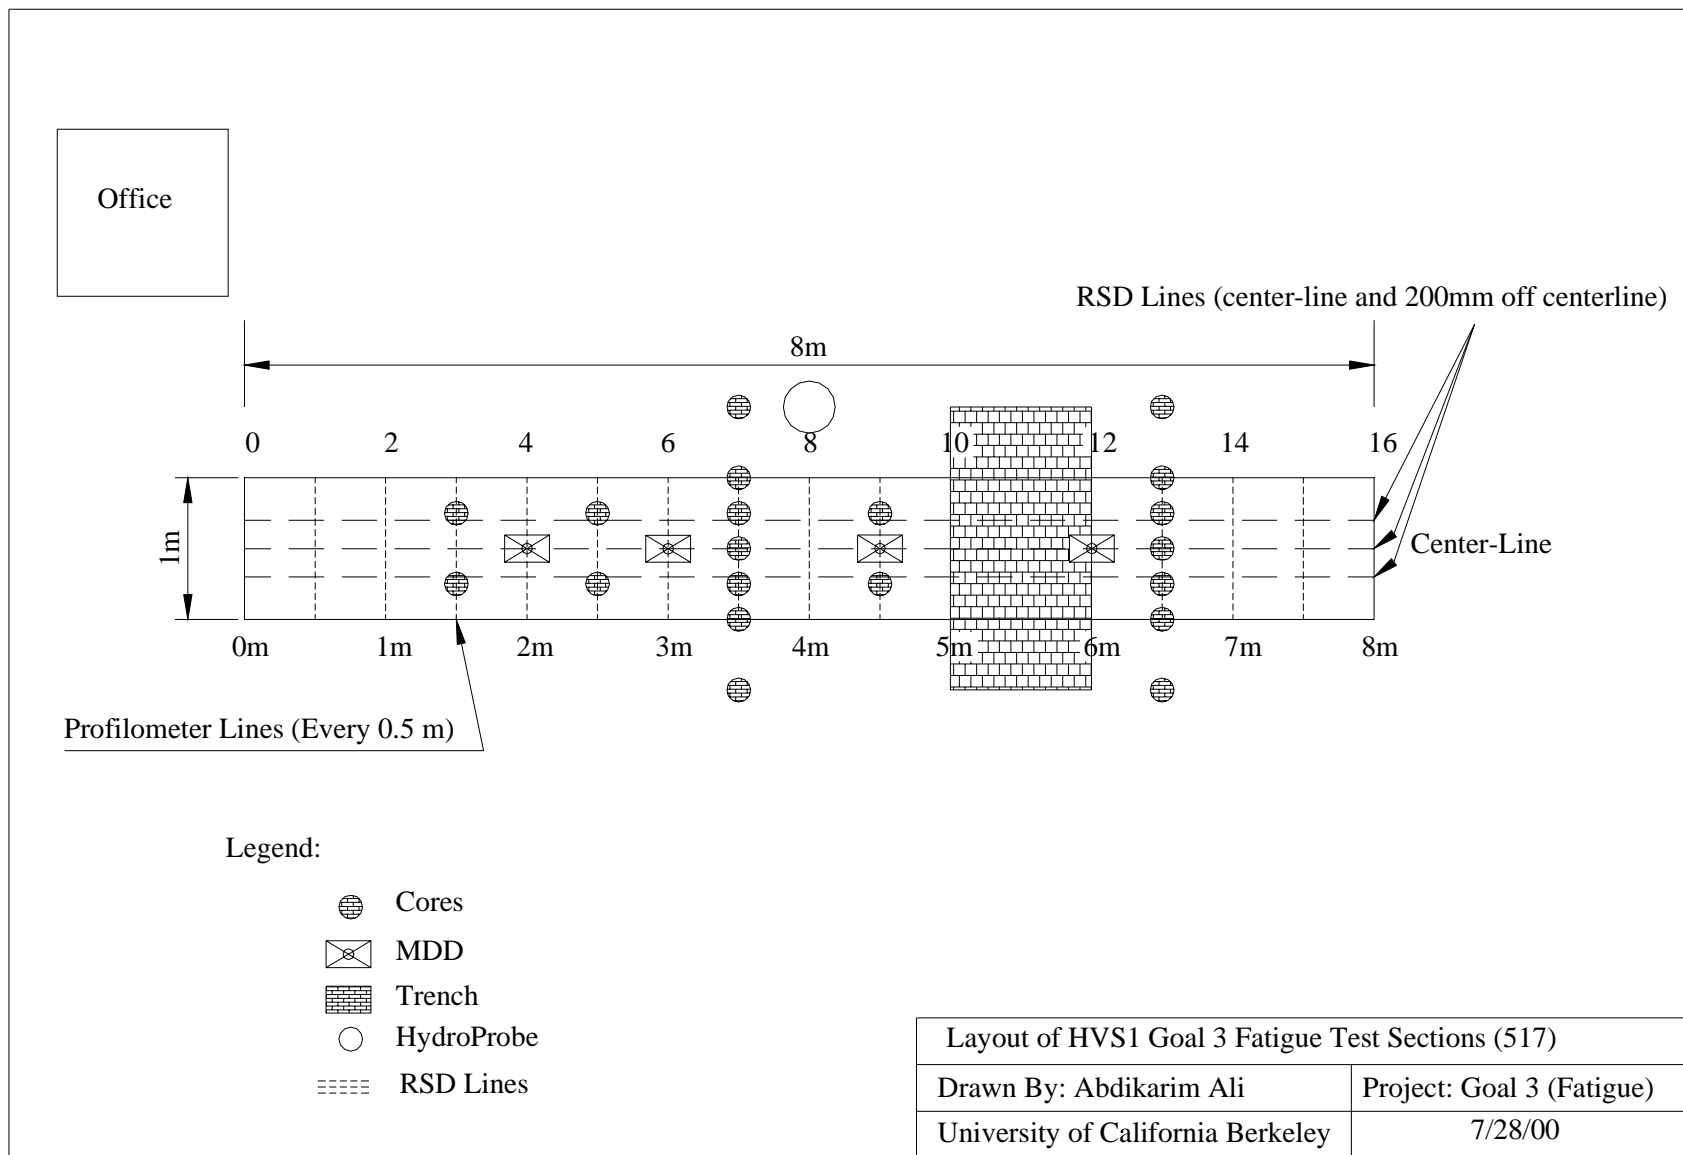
Locations of instrumentation, data collection points, and trenches and cores on Section 517 (undrained, DGAC overlay).
